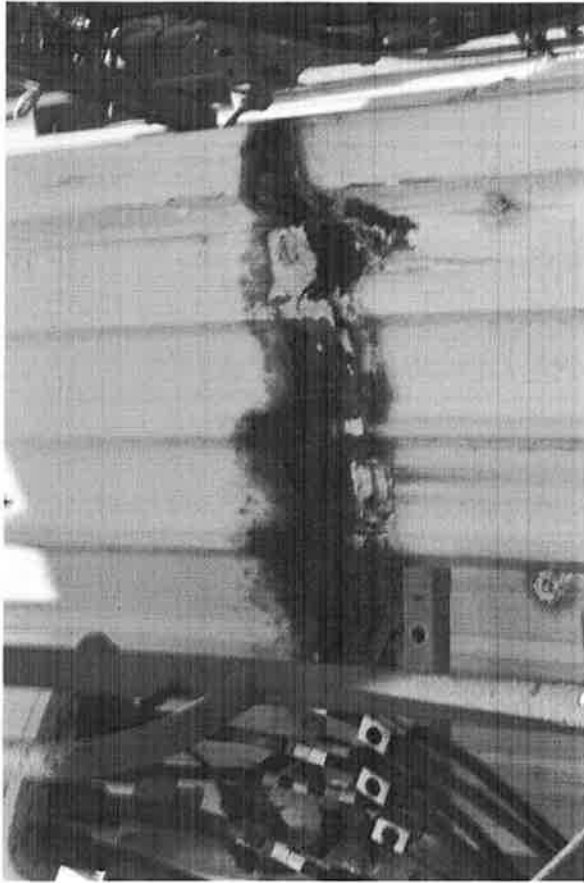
Close up view of sealant installed in weep holes in west side of building (typical)
